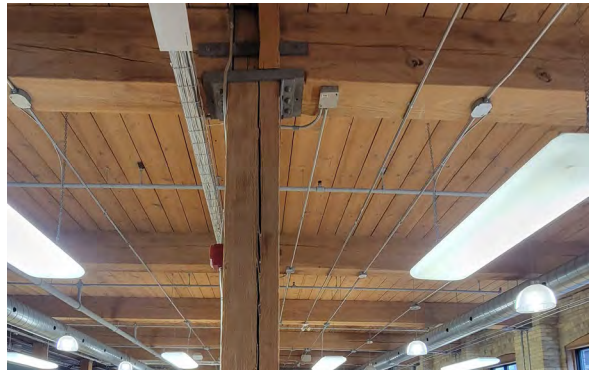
Post and beam construction with steel bracket (ERA, 2022).
